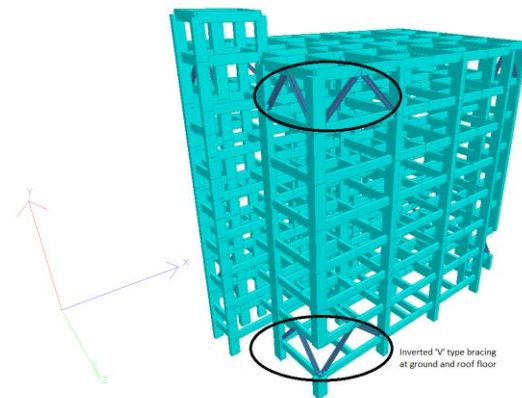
Render view showing bracing member provided as ground and roof floor level
